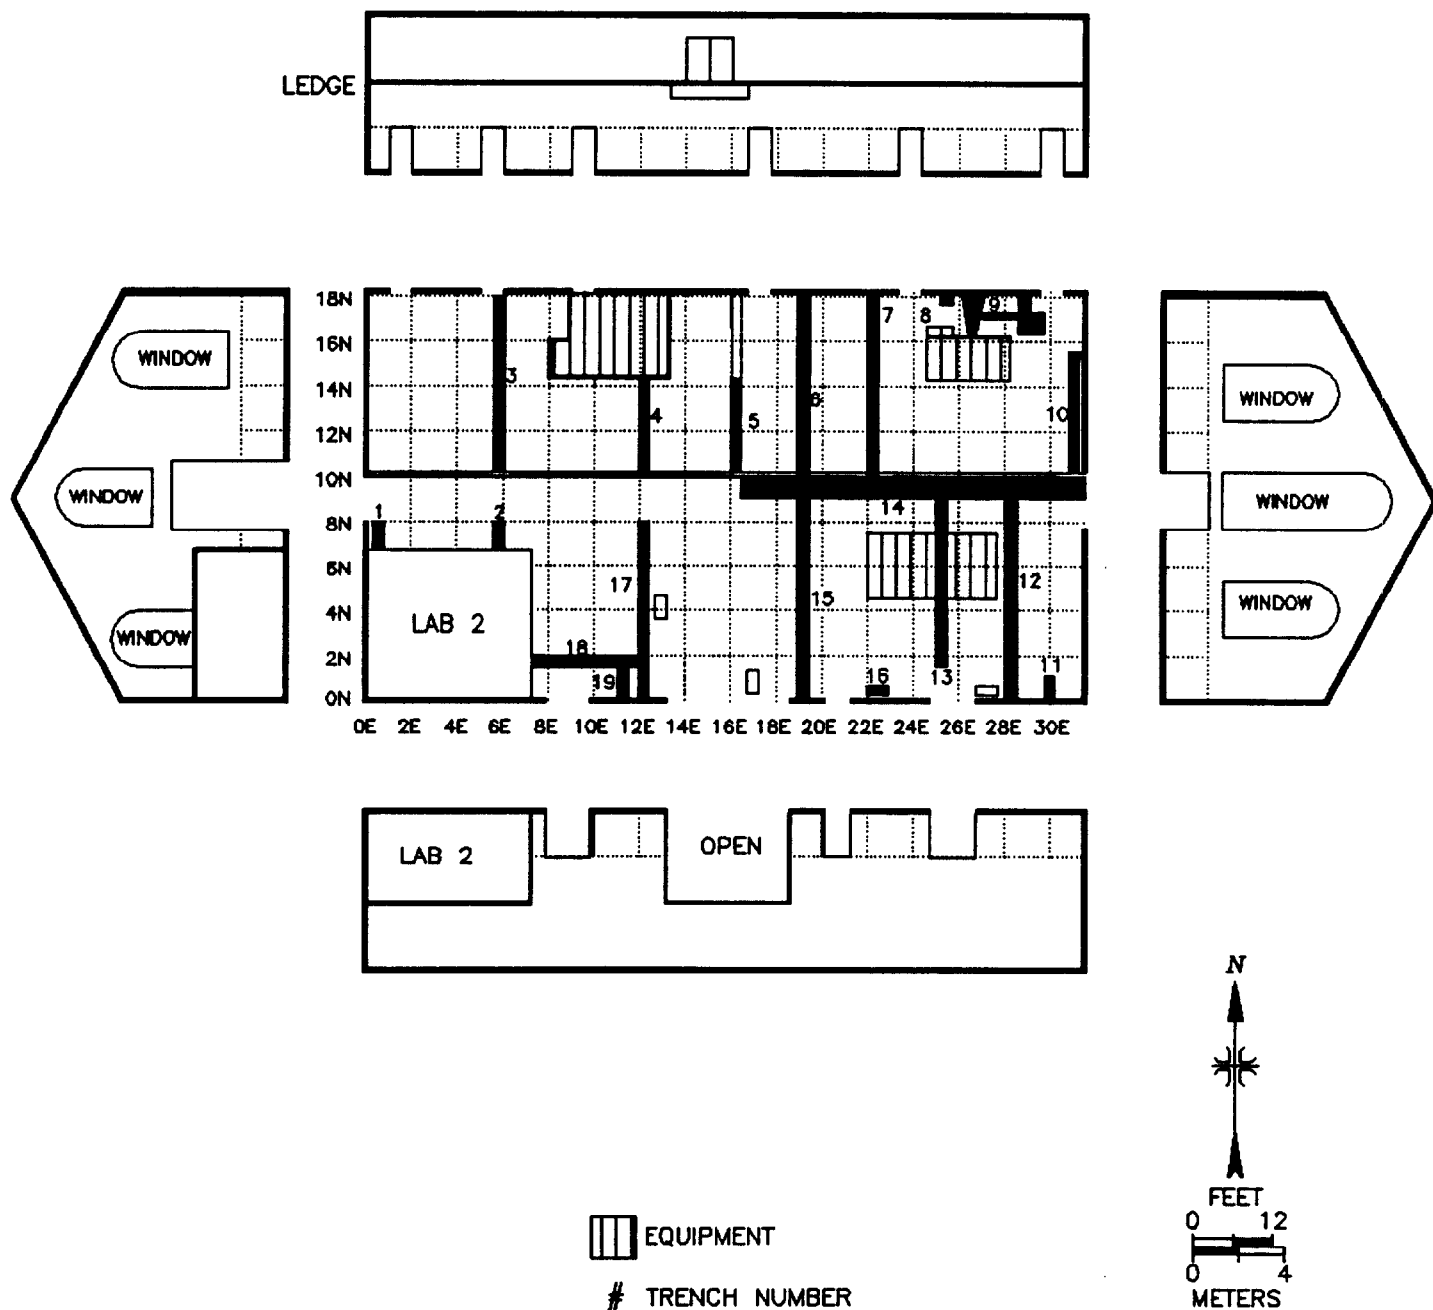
Building 23, Lab 1 — Reference Grid and Trench Locations
